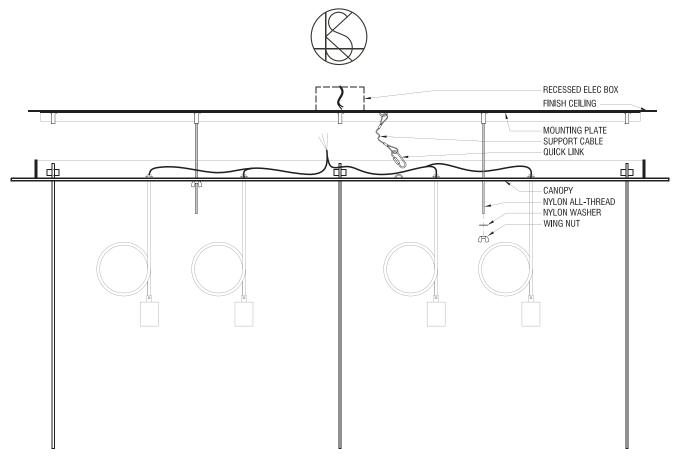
Install nylon all-thread rods into mounting plate and slide canopy up over rods
